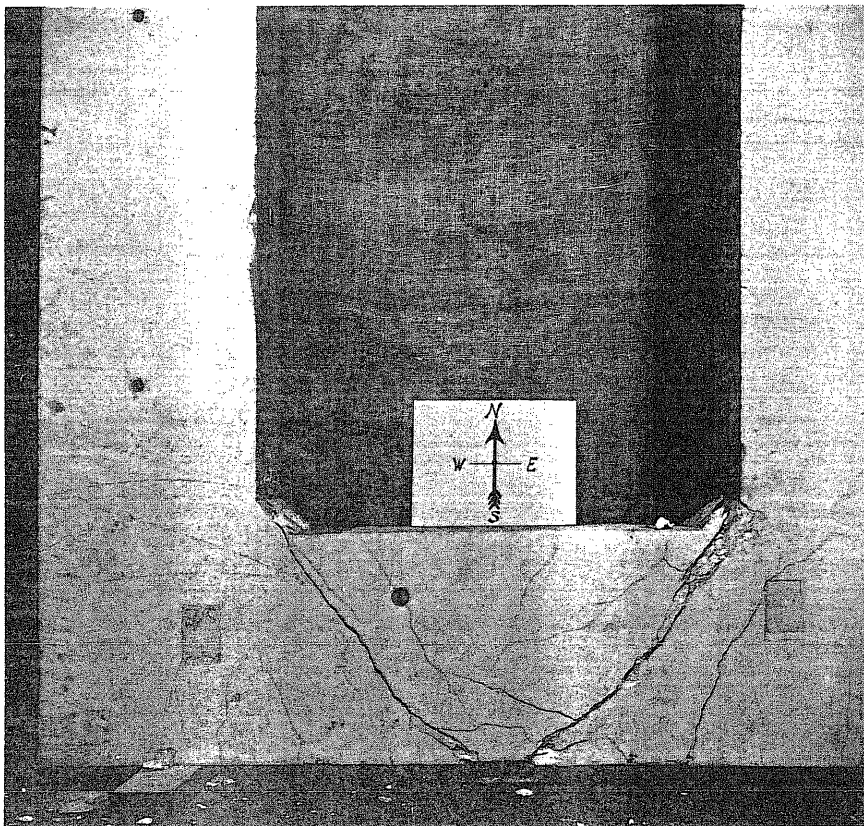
FAILED END SPAN OF SPECIMEN R1
